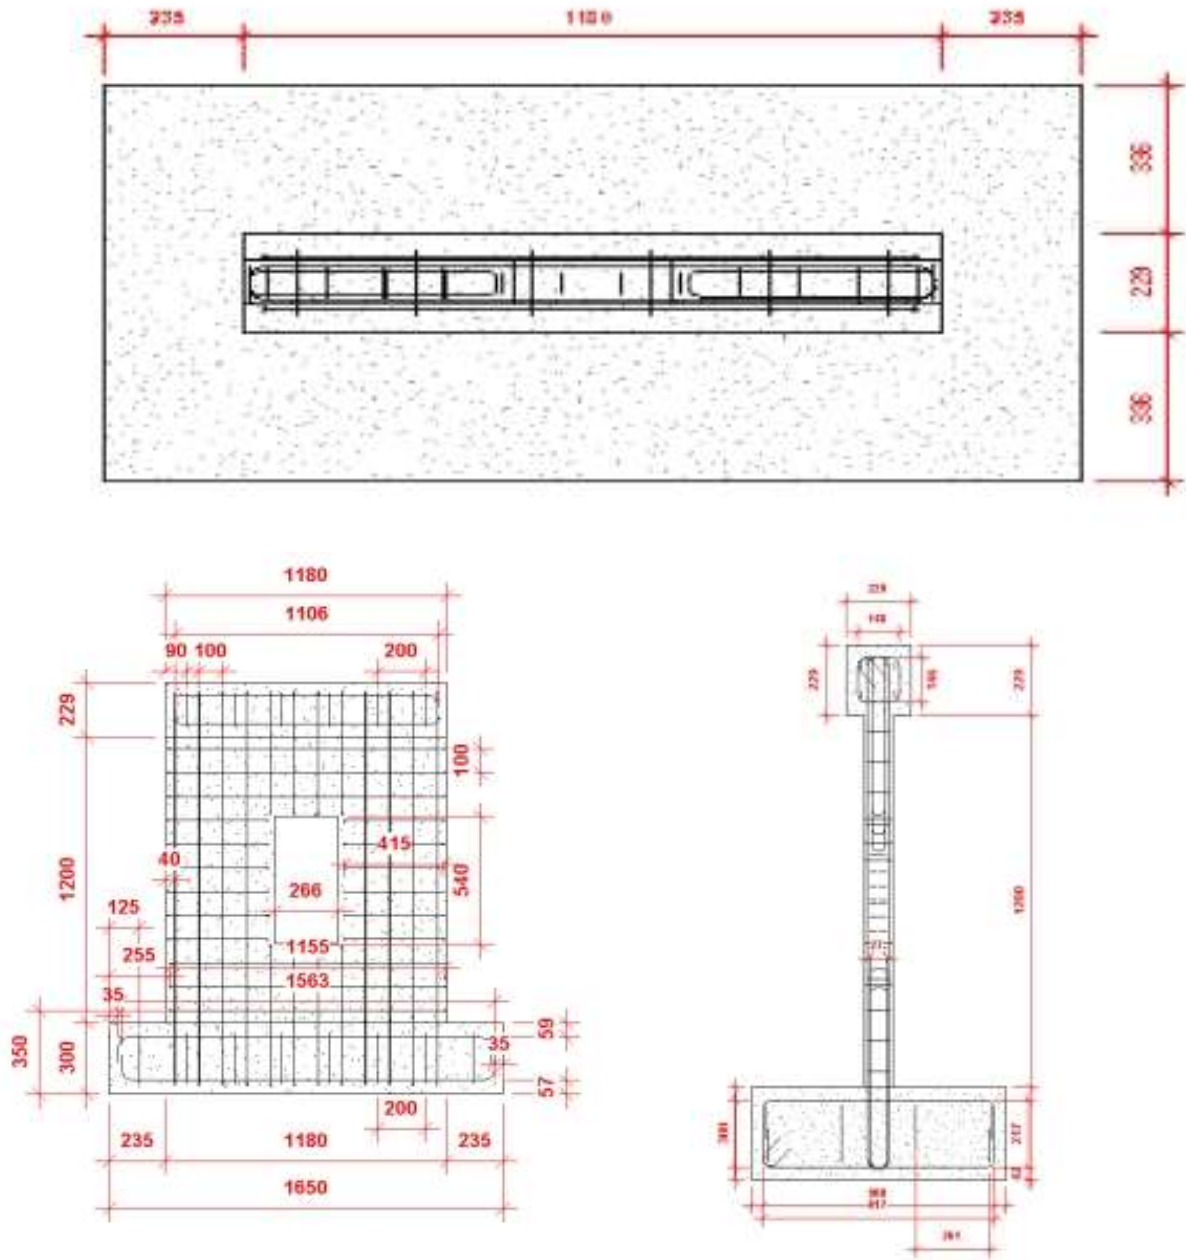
1: Reinforcement Details of experimental model with elevation, plan and sectional view
